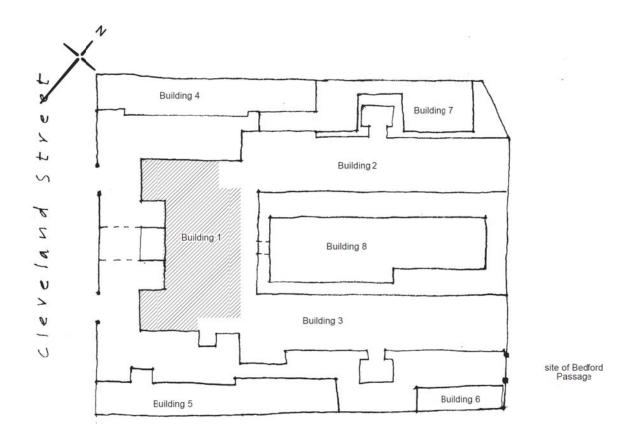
A site plan showing the numbered buildings on the site, 18th century fabric in tone (MOLA 2008)
